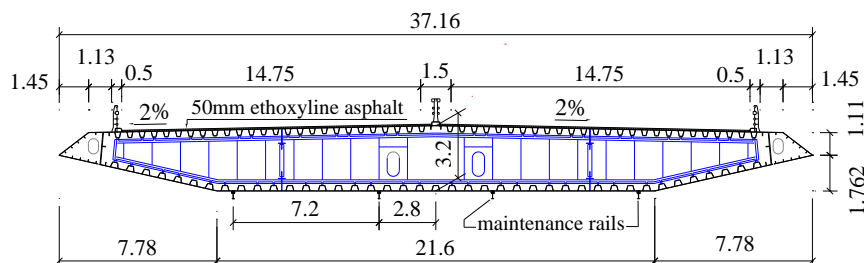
Deck cross-section of the 3rd Nanjing Bridge over Yangtze River
